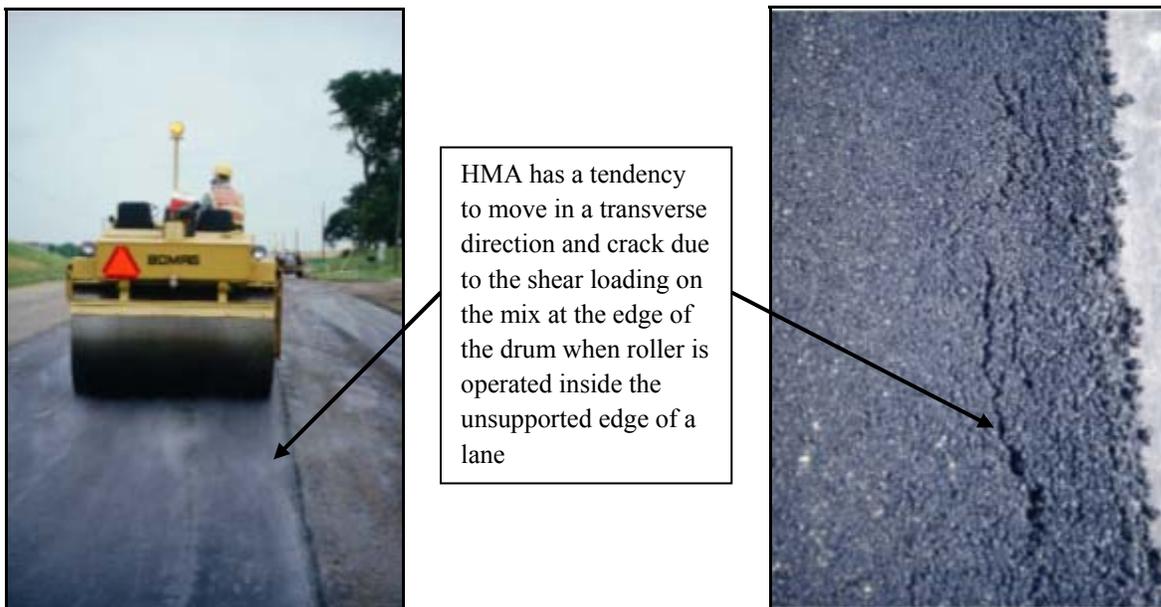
Operating roller drum edge inside the edge of unsupported pavement lane.
